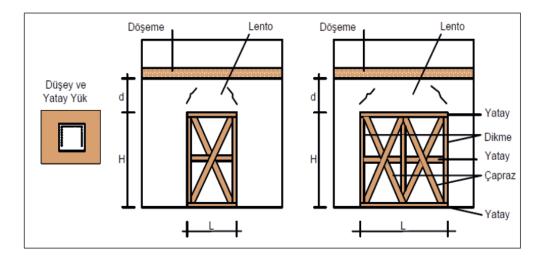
Scaffolding system of window openings (Source: General Directorate of Foundations' Guideline, 2017)
